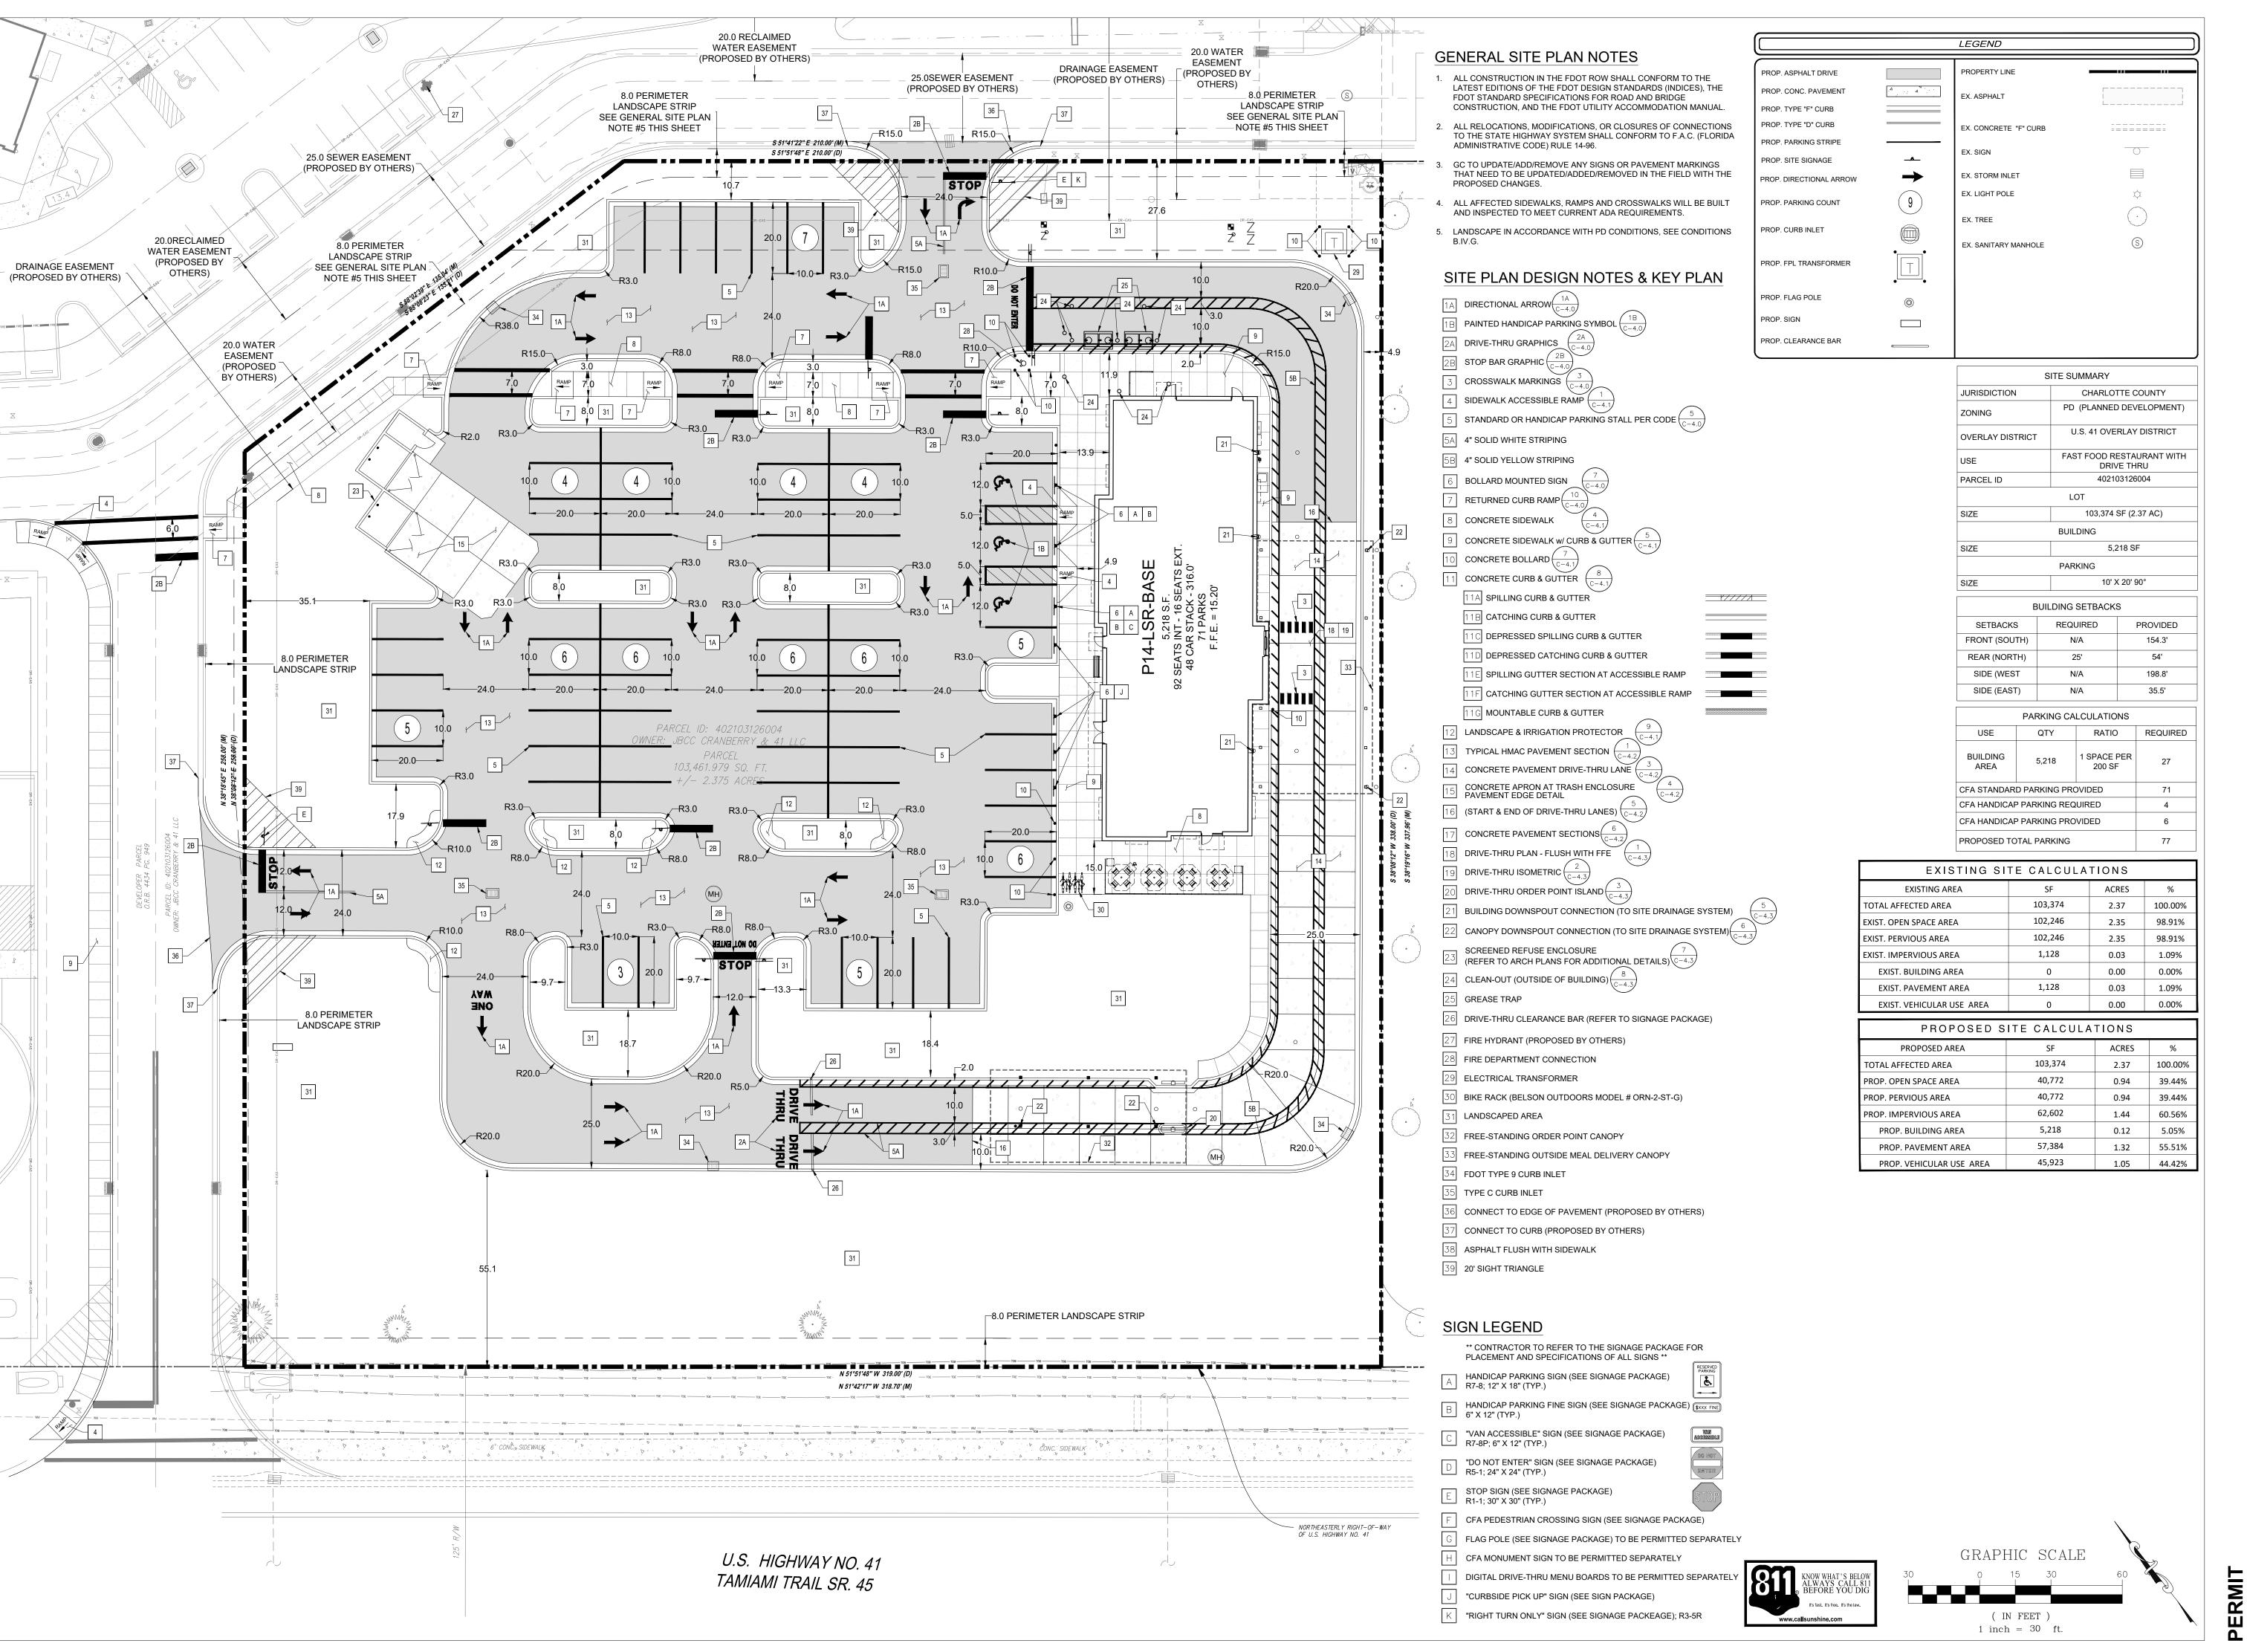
Chick-fil-A Detail PD Concept Plan
